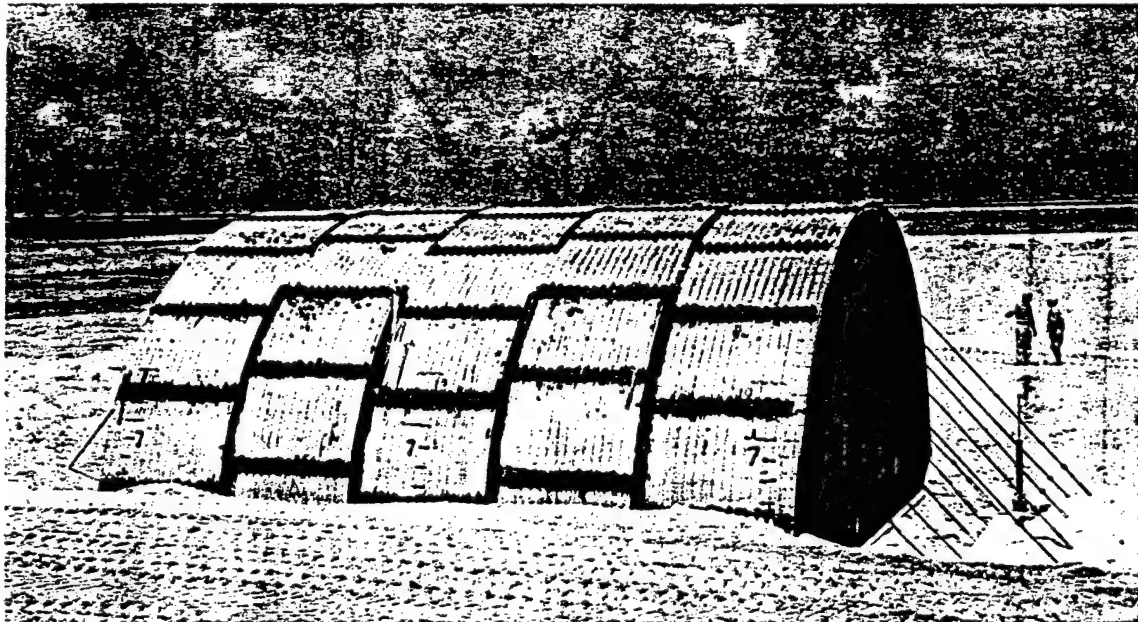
Structure 3.2d, endwall reinforcing by steel tie-rods and concrete deadman anchorage.
